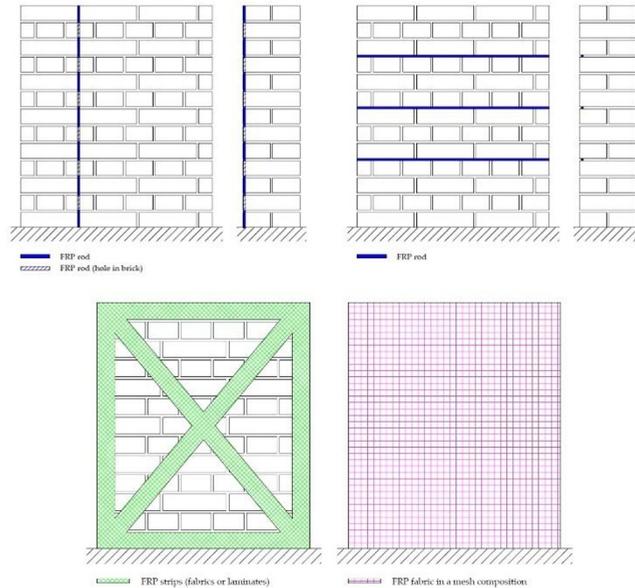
Systems of FRP reinforcement applied on masonry walls.
